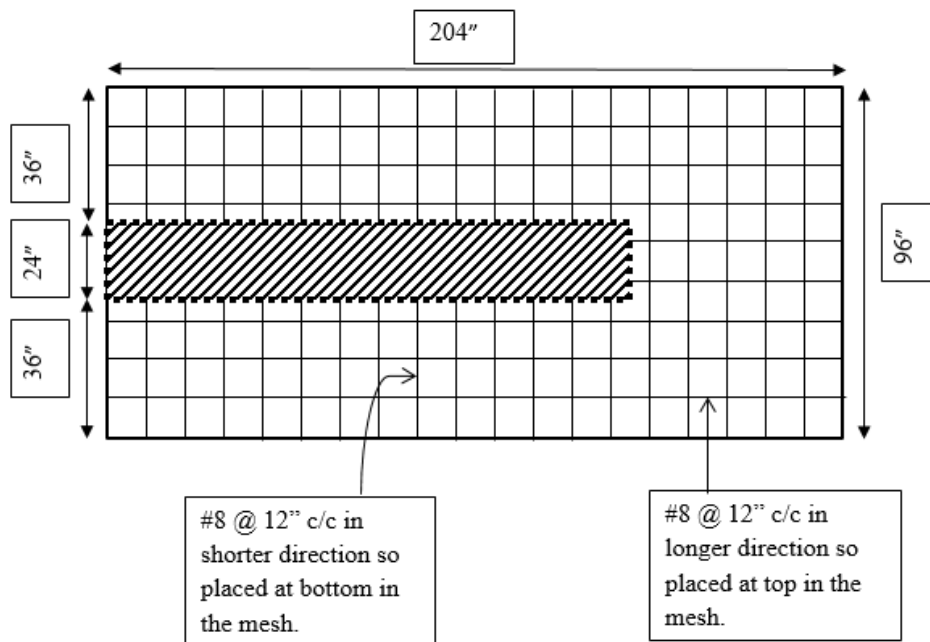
Reinforcement Detail of Footing at Bottom of Slab
